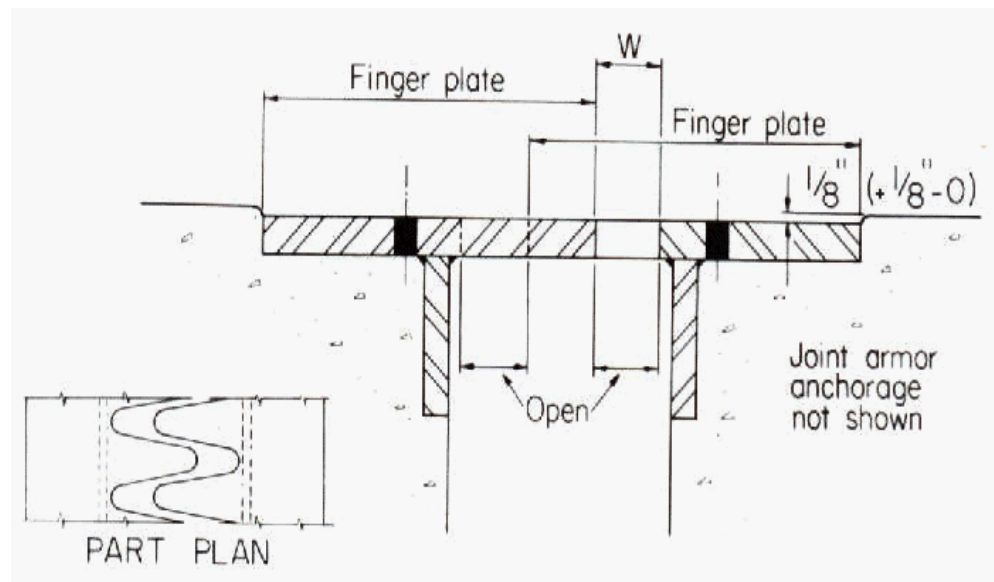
Cross Section of a Cantilever Finger Plate Joint
